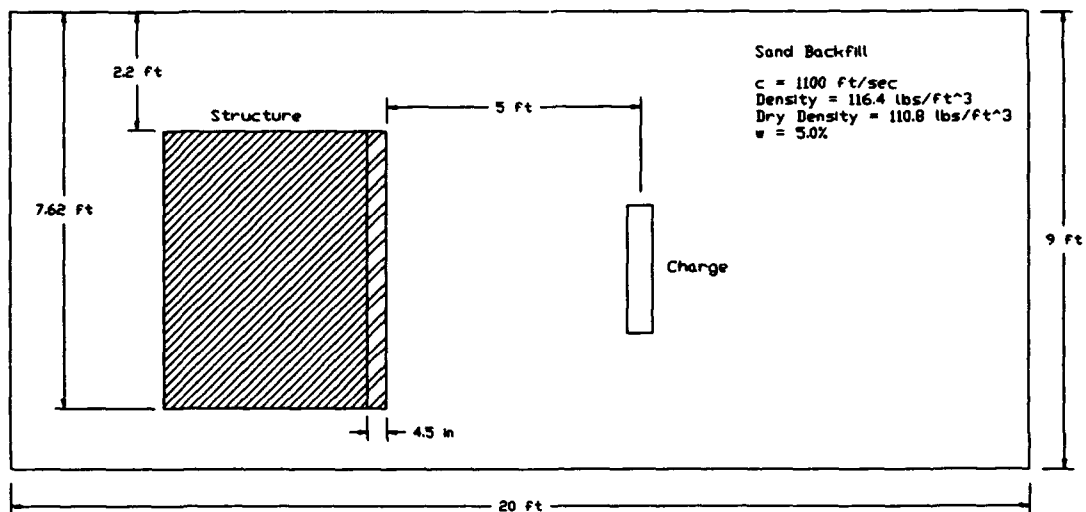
Section through CONWEB 3 test bed, showing backfill properties.
